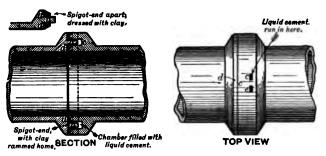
ABCHER'S AIR AND WATER-TIGHT SEWER PIPE,
